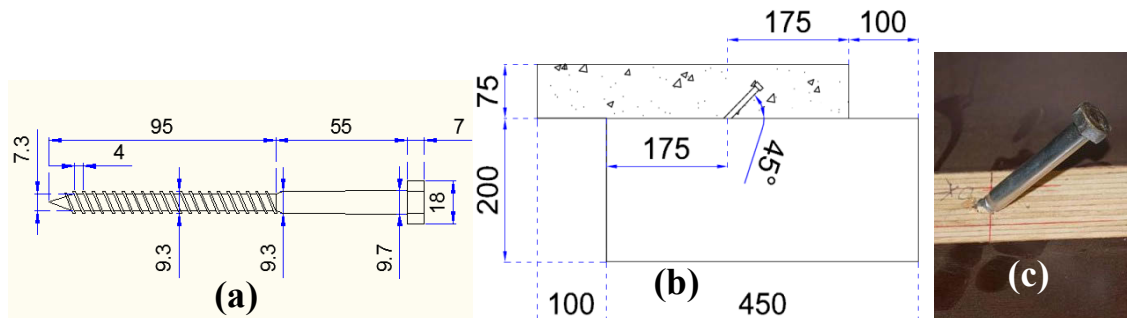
(a) Coach screw dimensions, (b) and (c) TCC specimen utilising coach screw
